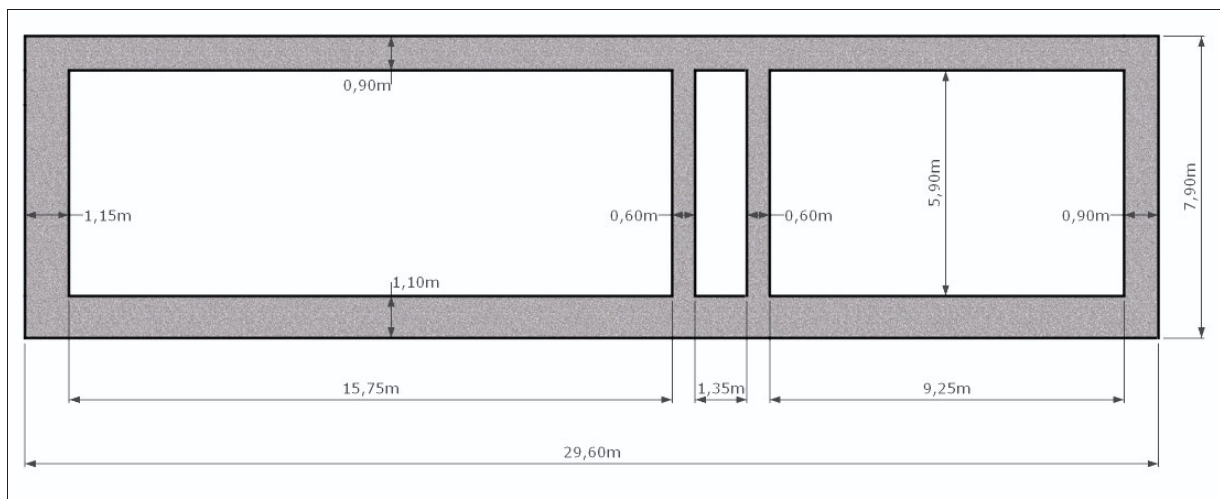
Cross-section second Coentunnel, developed by BAM Infraconsult
